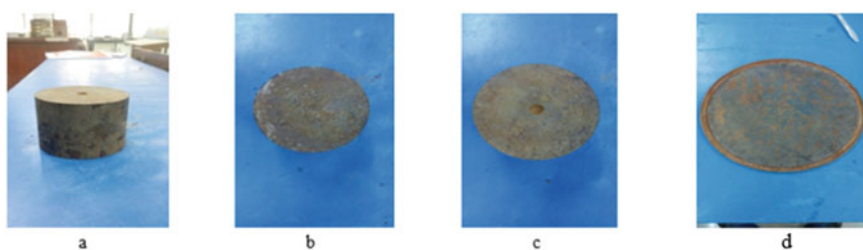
Footing geometry a Circular steel footing b Smooth base footing, c groove at top to apply point load to the footing, d Base plate
